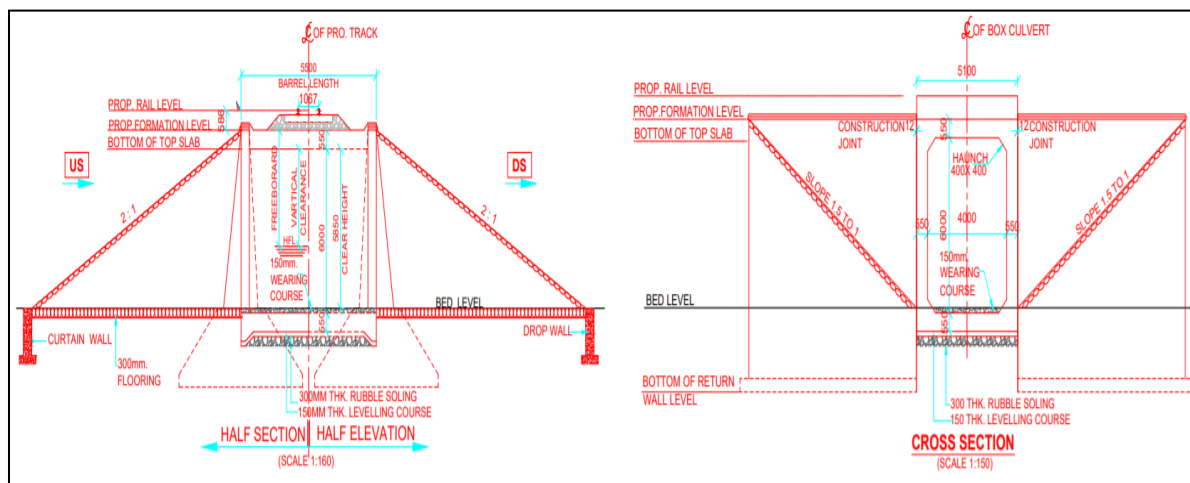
Typical GAD of 1 X 6 Box Culvert for Minor Bridge
